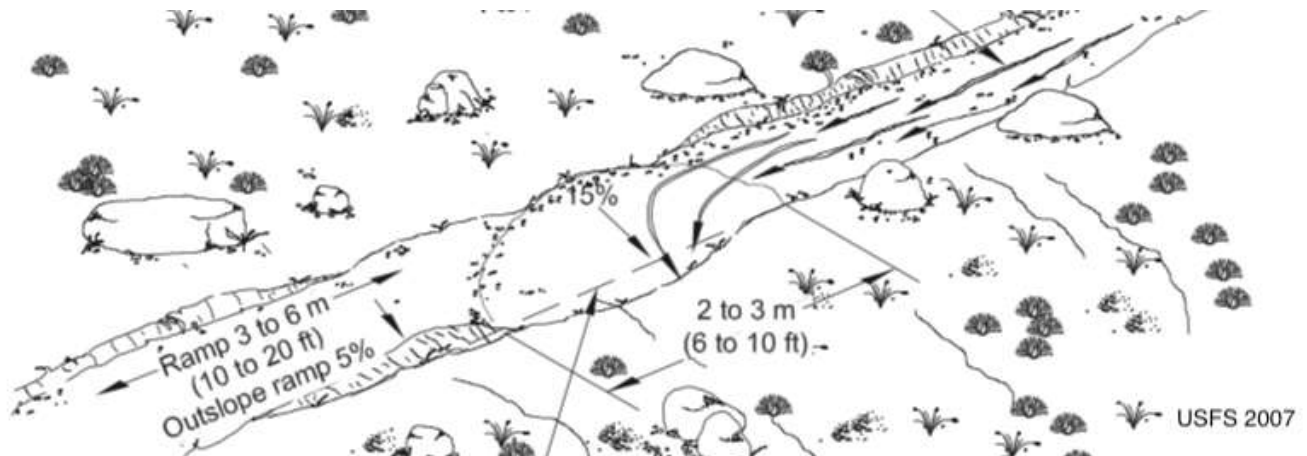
Drainage outlets direct water off steep sections of trail. (Source: Trail Construction and Maintenance Notebook, USDA 2007)
